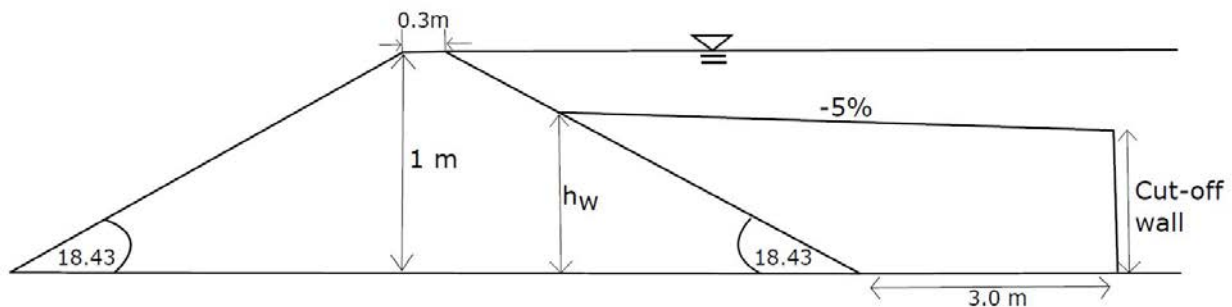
Test Series #2 – general cross-section (schematic, not to scale)
